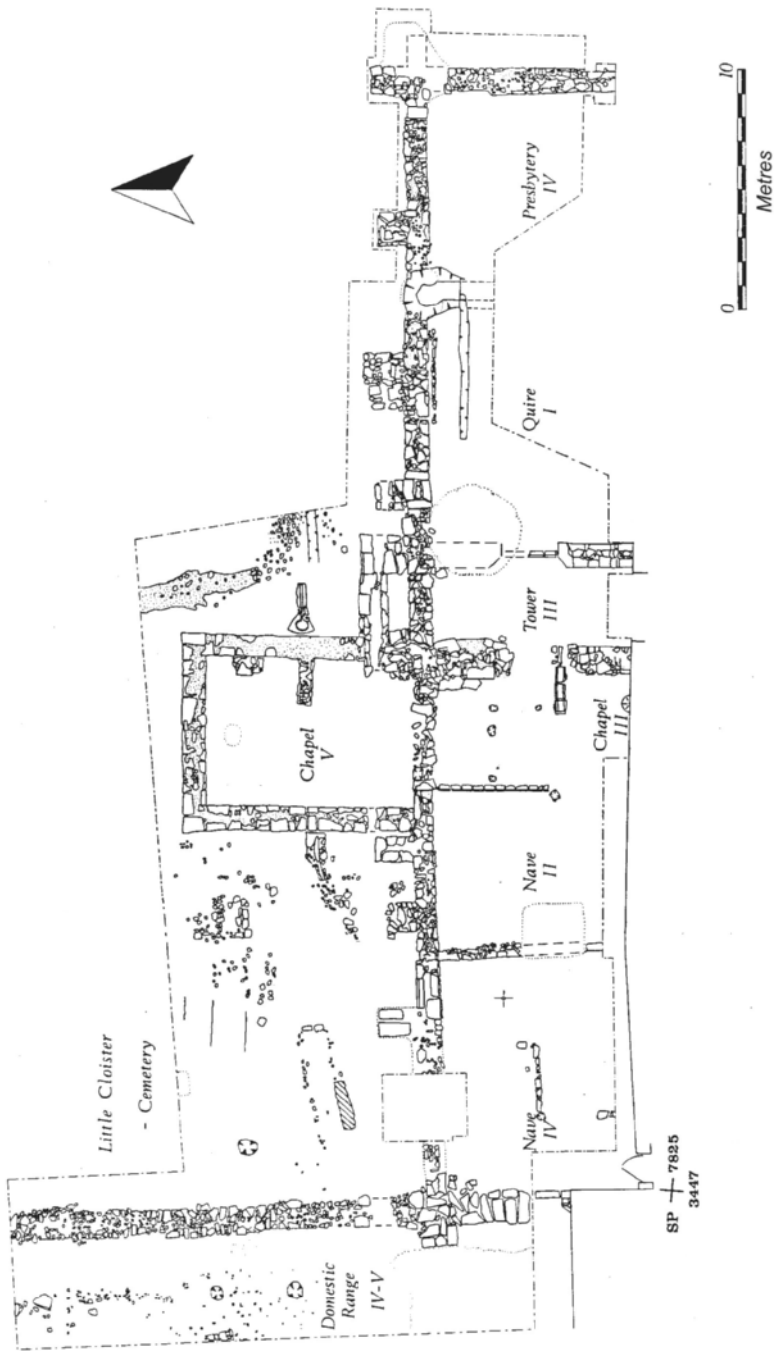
Charterhouse: plan of St Anne's church, excavated 1984-87
